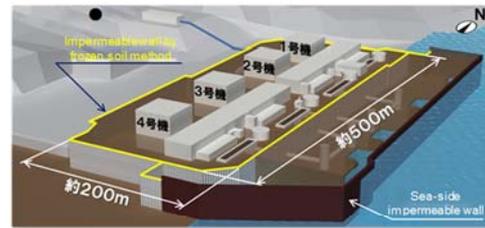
(3) Large-scale verification of impermeable walls (frozen wall)
